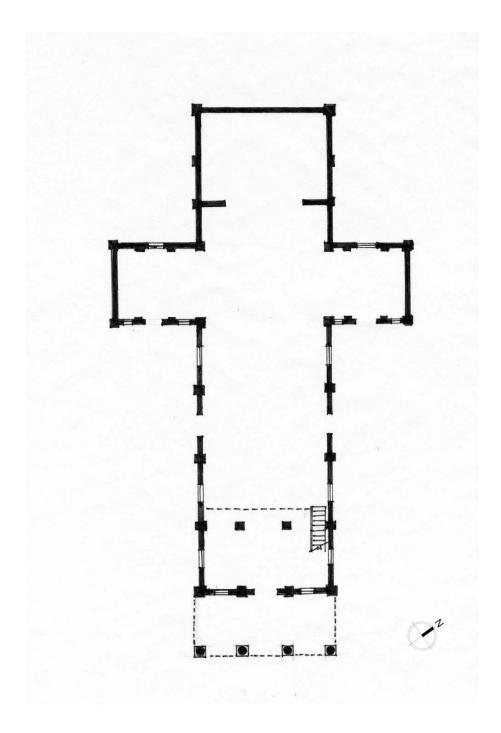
Ground floor plan of La Purisima Concepcion Church in Catigbian.
